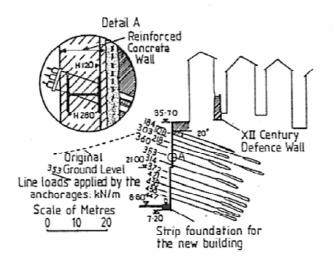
Vertical cross-section through the anchored wall (from Hanna, 1982)
